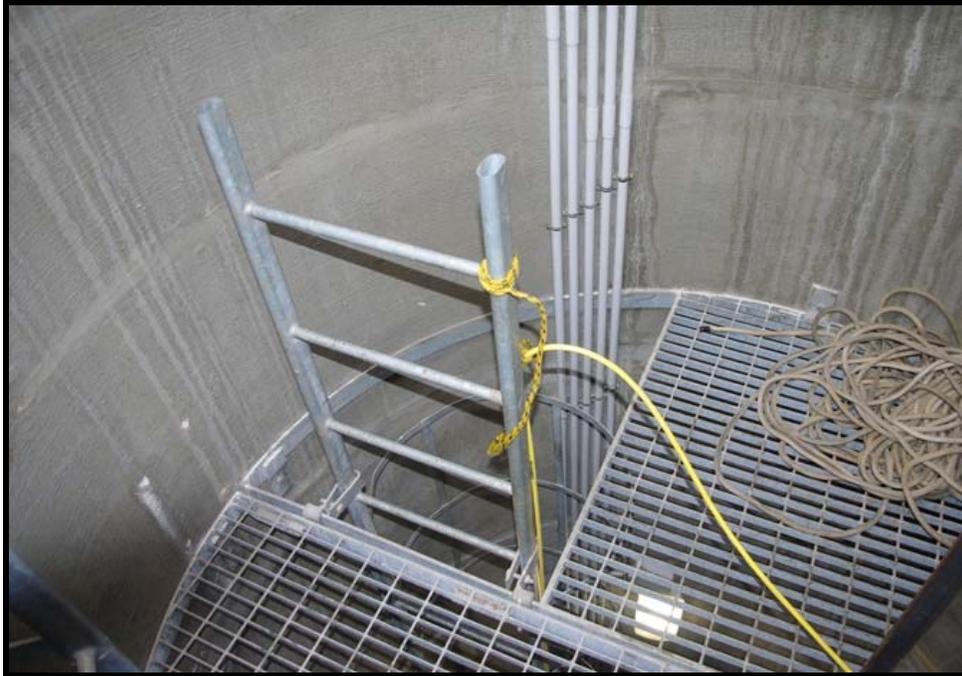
Access tube, ladder, platform, and conduits.
